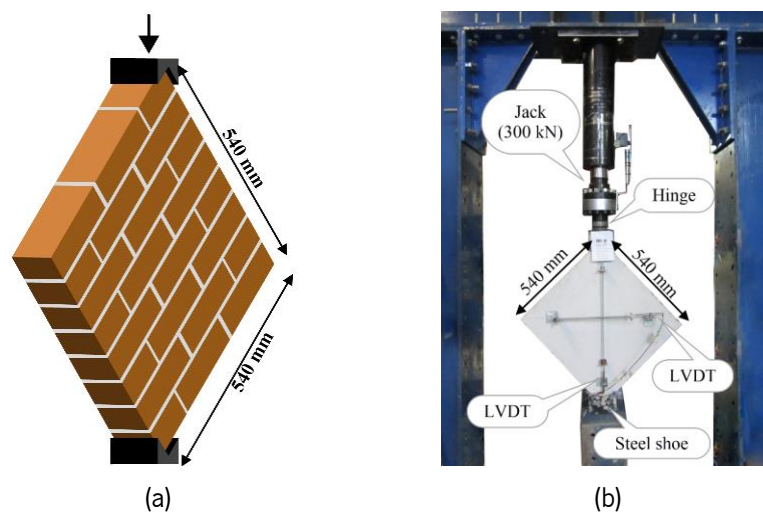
Diagonal compression tests: (a) geometric details; (b) test setups.
